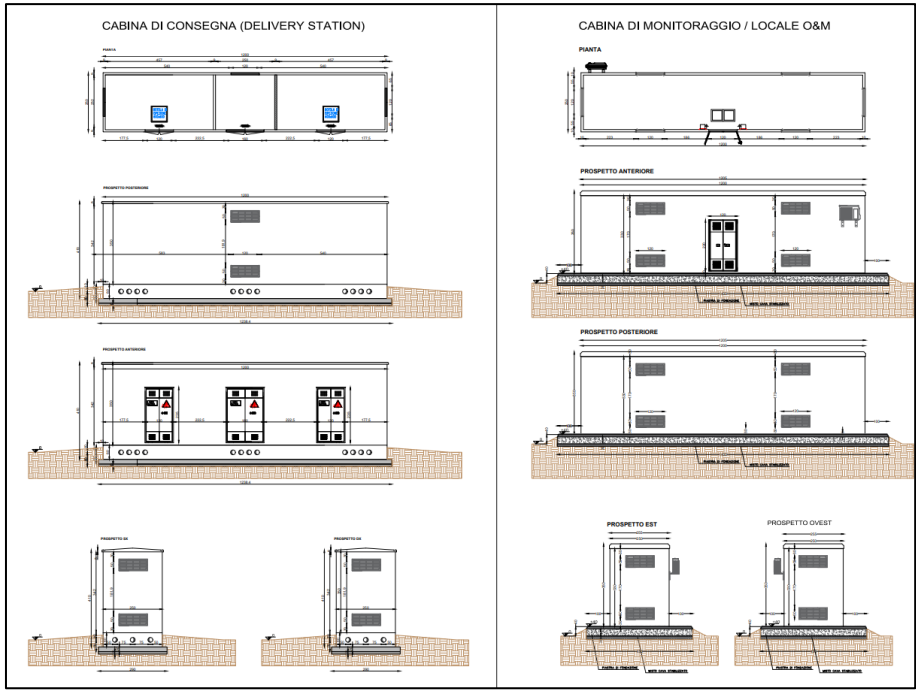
Extract of table "Detail of the delivery station, monitoring room and O&M room (plans and elevations)"
